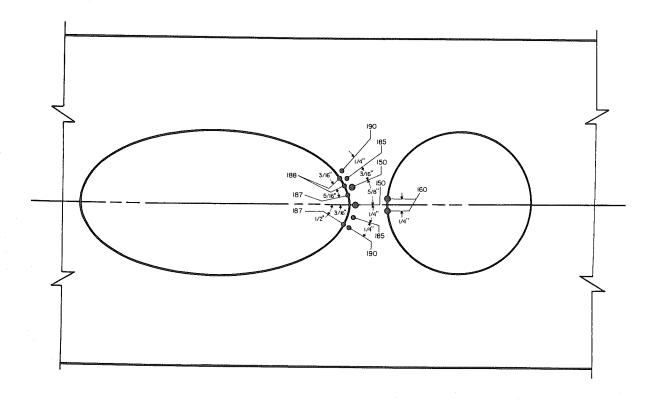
JOINT TYPE I - SPECIMEN No. 4, DETAILED CRACK PROPAGATION IN HORIZONTAL MEMBER WALL
